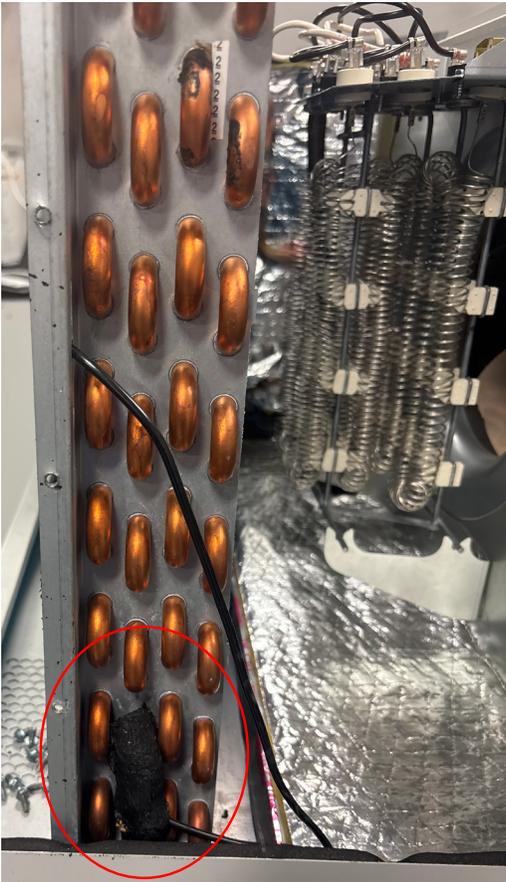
(Indoor Coil Temp. Sensor, T2) To access the evaporator coil sensor remove the top panel and right side upper panel.
